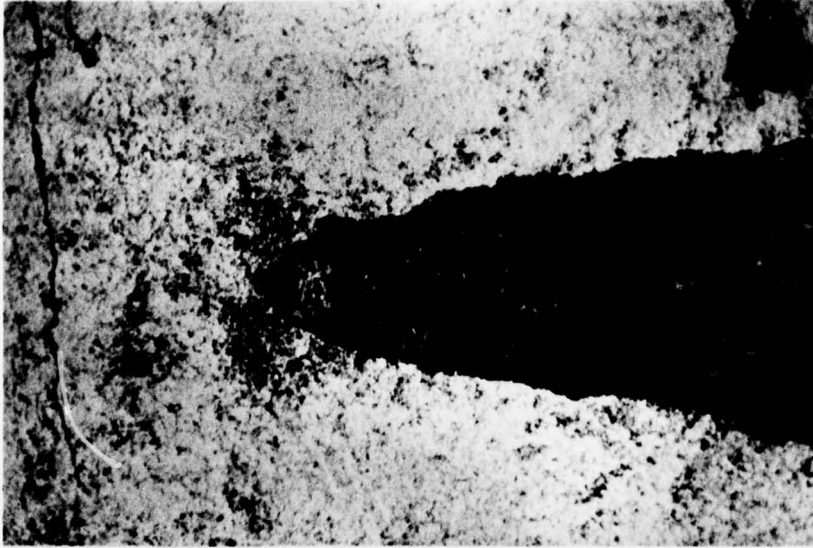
Drain hole in gunitite facing on downstream face of dam.
